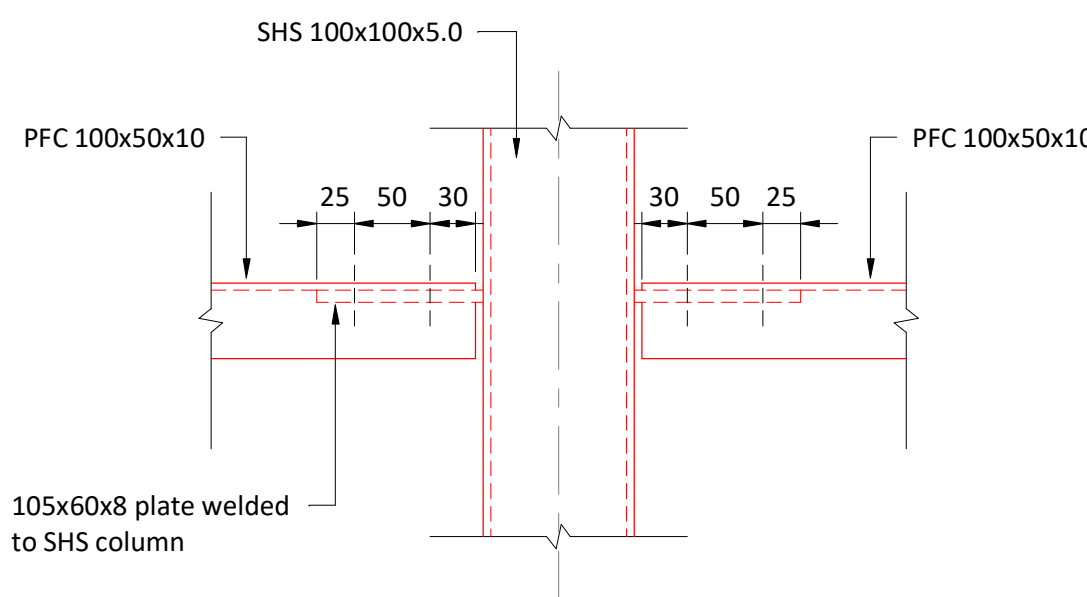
Rail to Post Frame by Existing Brickwork (Plan)
